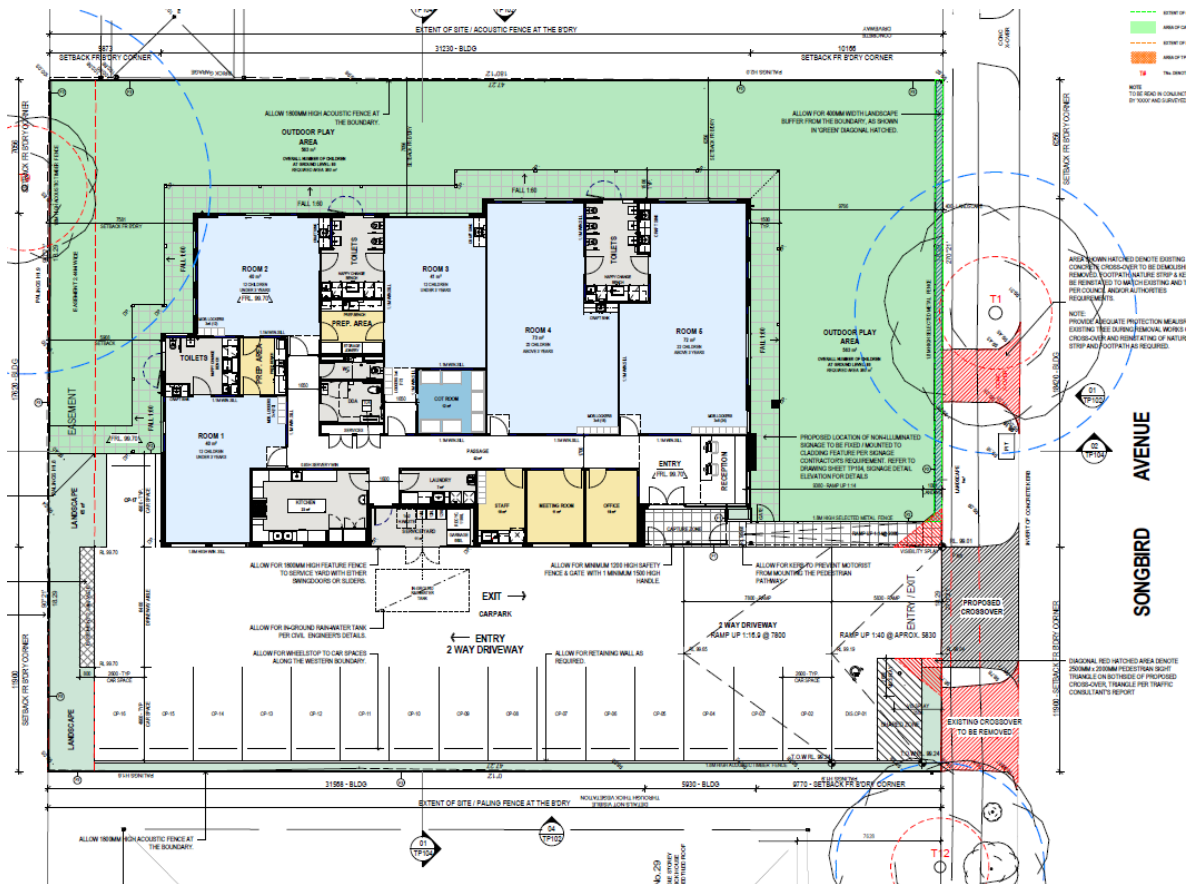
PROPOSED DEVELOPMENT FLOOR PLAN. SOURCE: POINT ARCHITECTS (REV: TP3)
